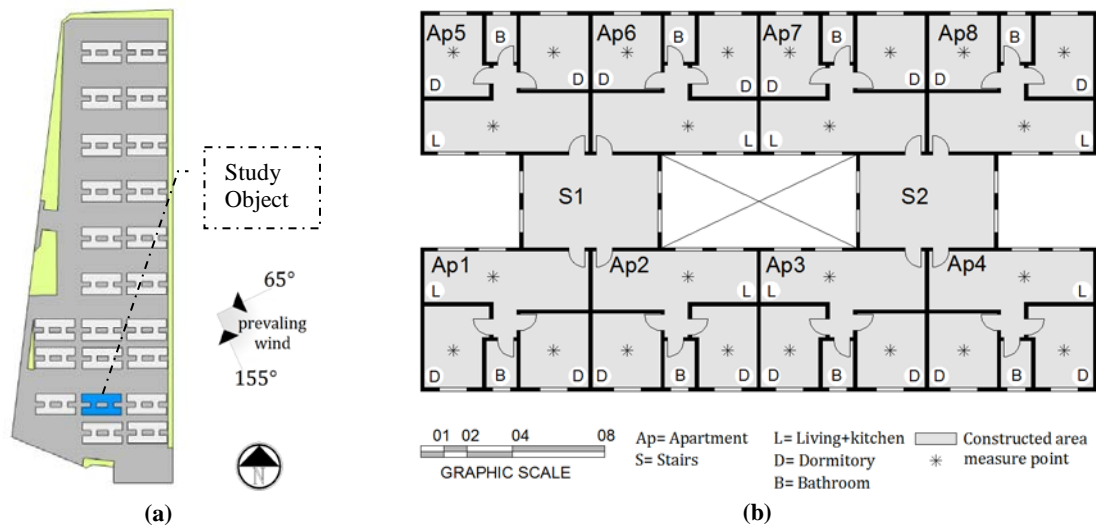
(a) - Location of the reference building at the residential complex; (b) - Floor plan of the Parque Piazza Navona residential complex.
